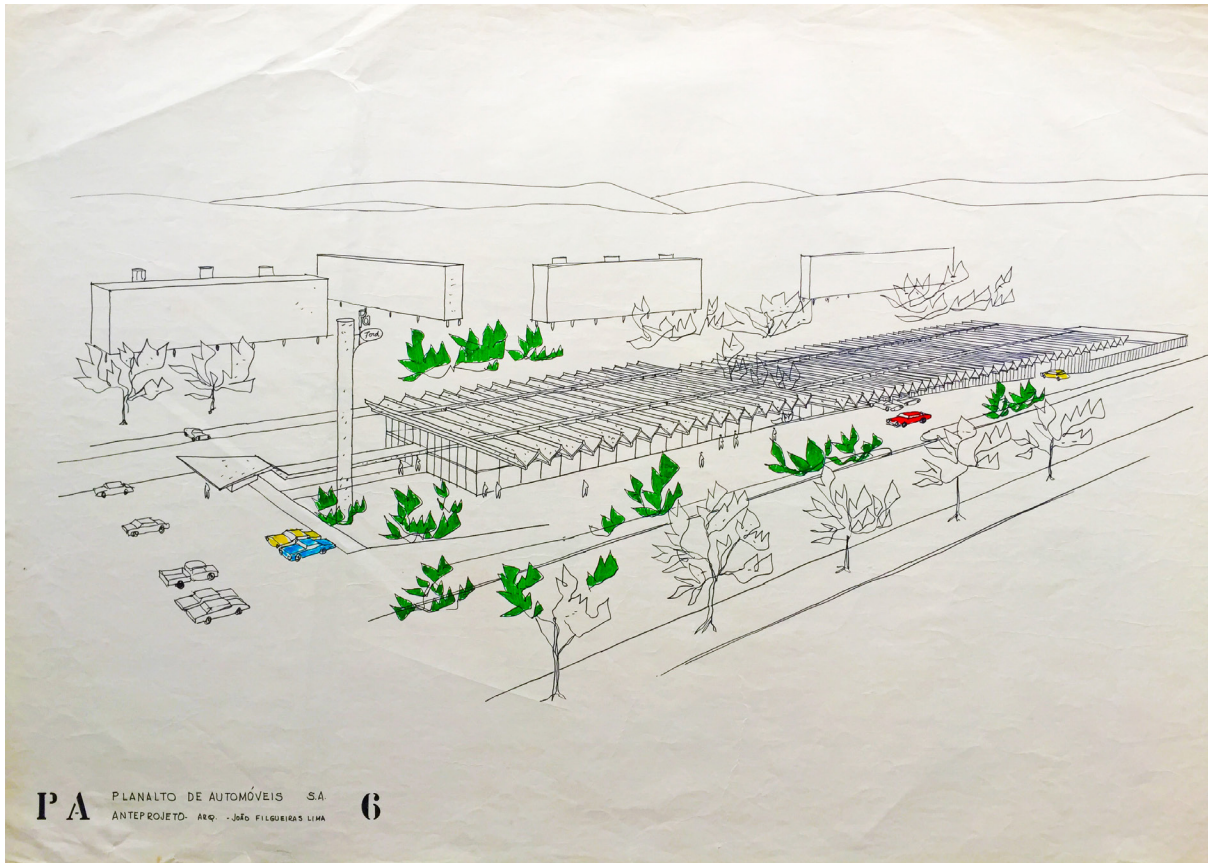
Drawing plan for the Planalto de Automóveis workshops. Aerial view of the complex. João Filgueiras Lima, Brasília, 1972. Arquivo João Filgueiras Lima, Salvador
